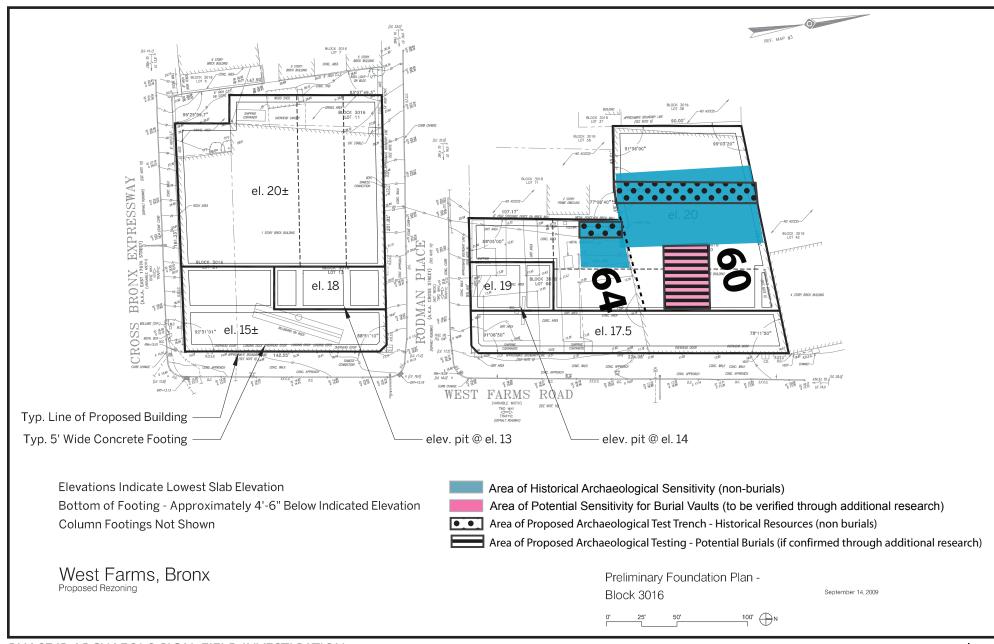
Crotona Park East Proposed Rezoning Site, Approximate Locations of Potential Archaeological Sensitivity and Proposed Test Trenches (from Dattner Architects, 2009)
